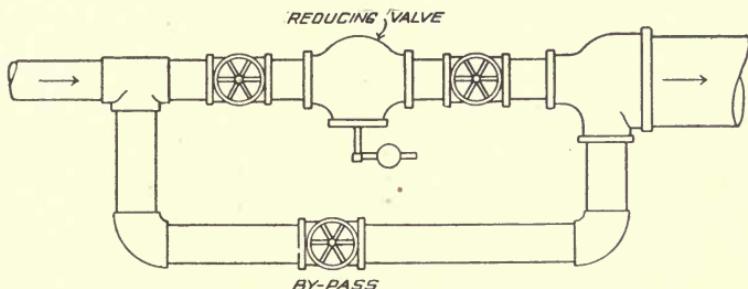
Connections of Reducing Valve in Exhaust-Steam Heating System.
